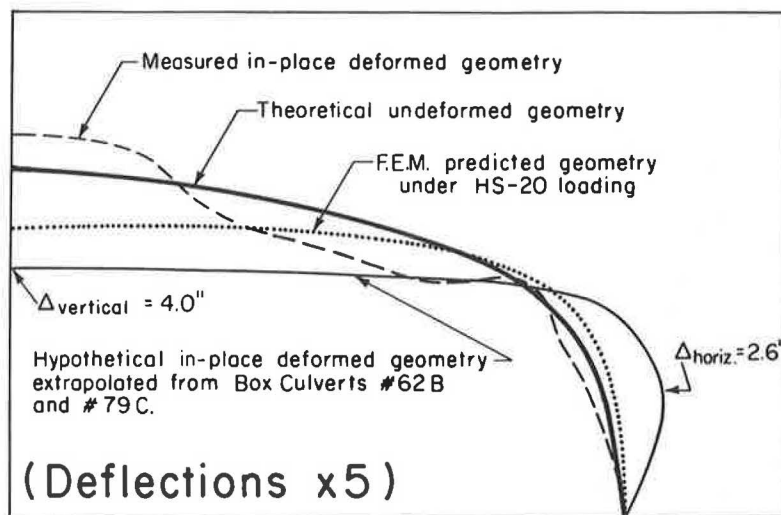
Undeformed and deformed geometries of Box Culvert 56B.
